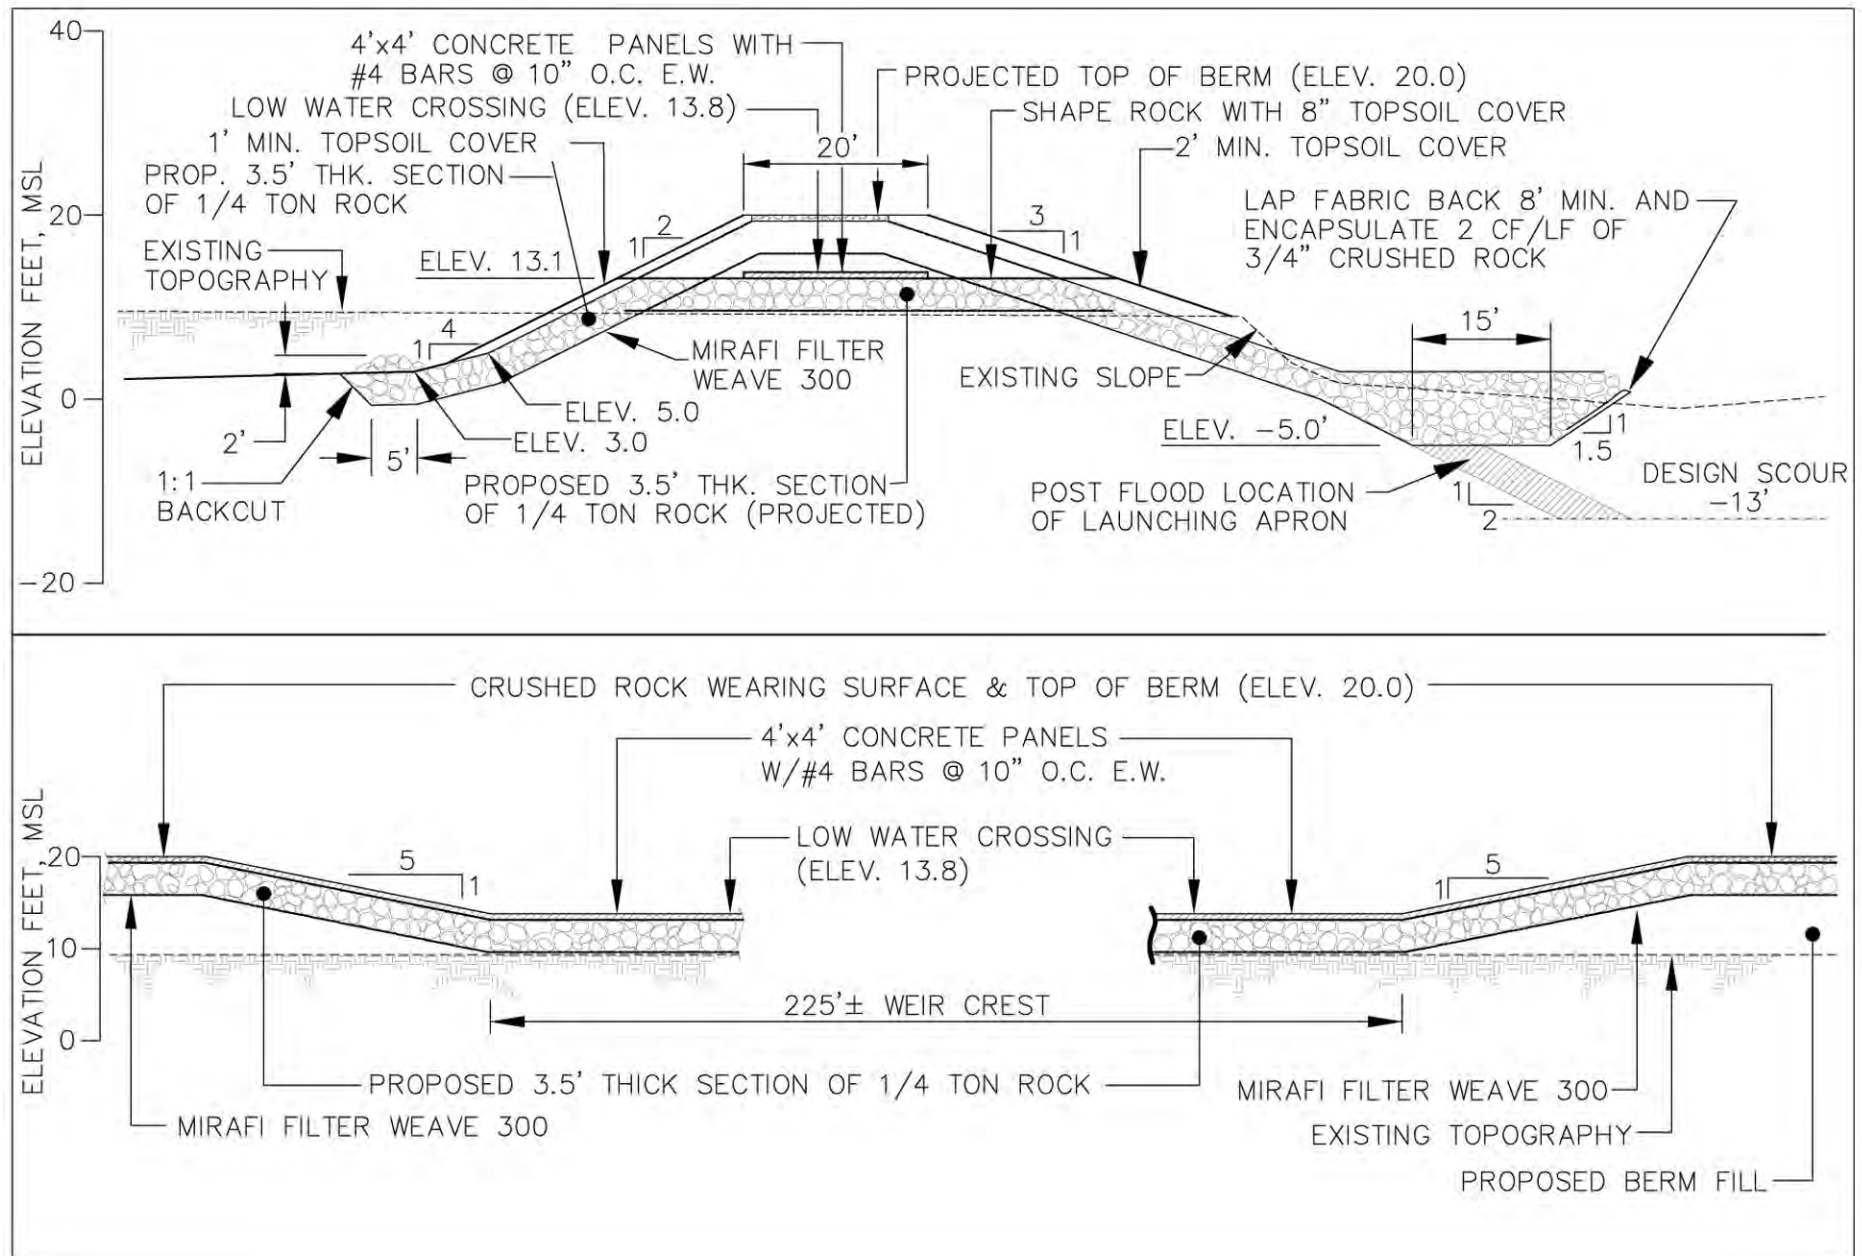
Typical Section Rock Slope Protection Through Upstream Weir Section
